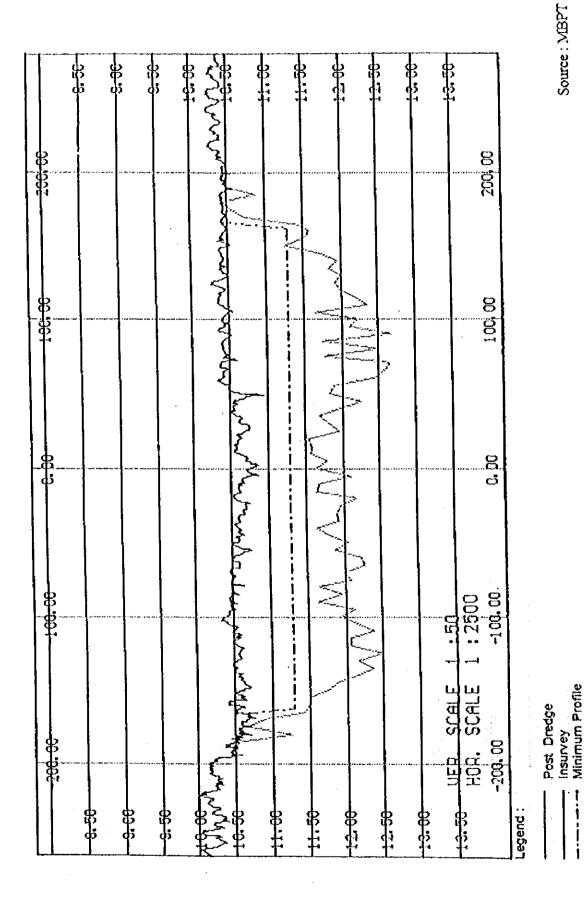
Typical Cross Section of Main Channel (Section 4C)
